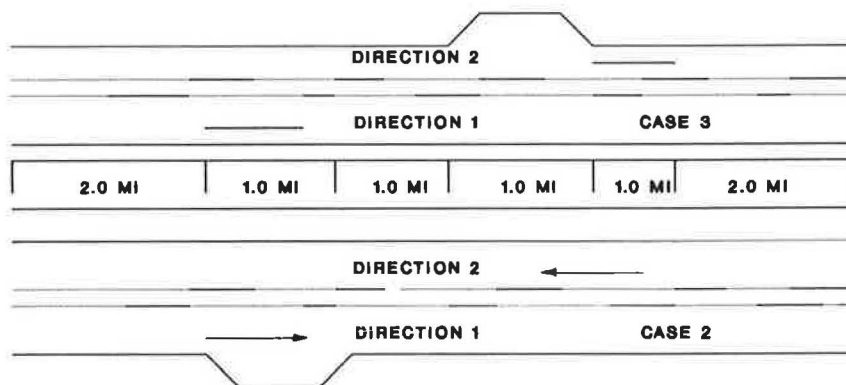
Layout of roadway for typical case study with one passing lane in each direction.
